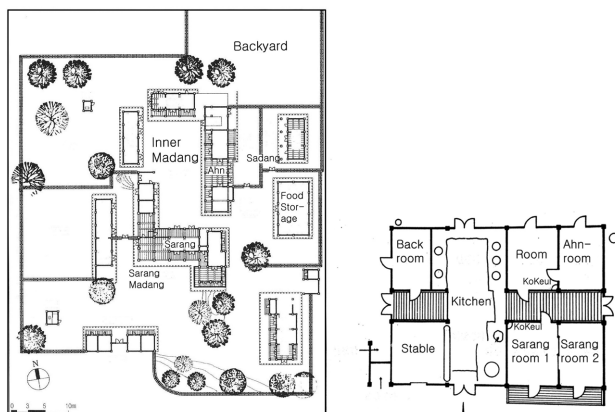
Plans of a Typical Literati Hanok in Gyeongnam Province Named Jeong-byungho House (on the Left) and a Plan of a Neowa House in Samcheok Neowa Village (on the Right)
